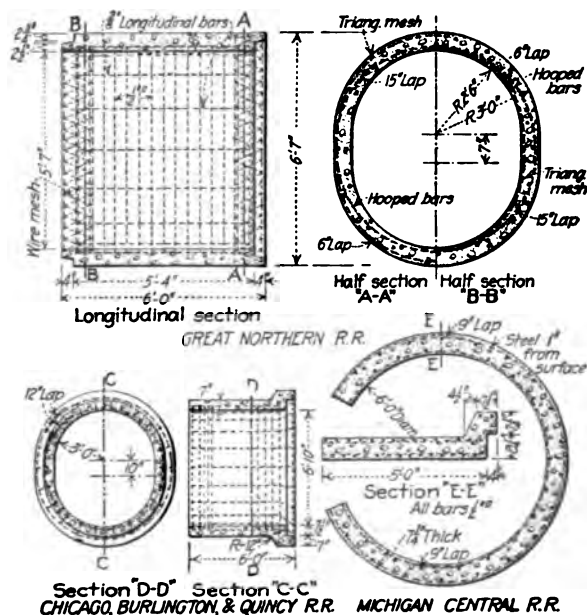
Three designs of reinforced-concrete pipe for railway culverts.
